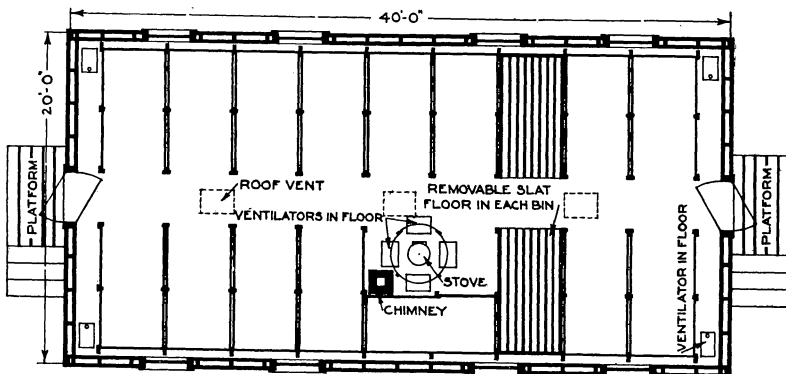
Floor plan of a sweetpotato storage house, size 20 by 40 feet, having a capacity of 2,000 bushels in crates or 2,500 bushels in bulk, showing location of ventilators, stove, arrangement of bins, and other details.
